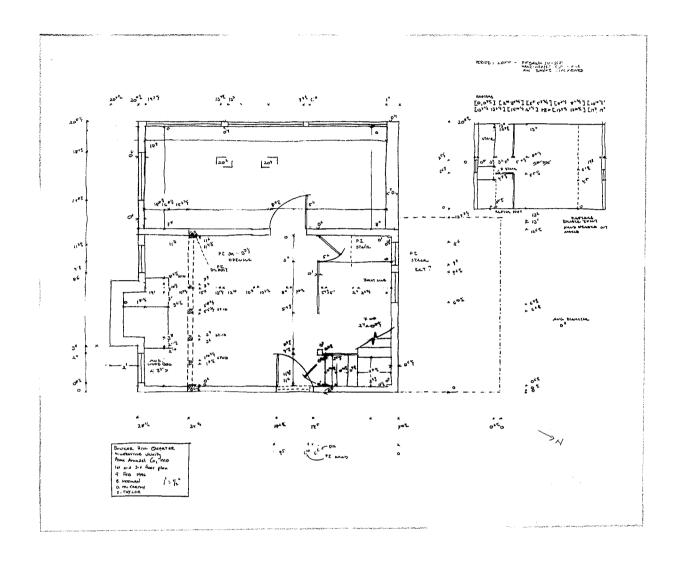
Bunker Hill Quarter, field notes for first and second floor plans.
